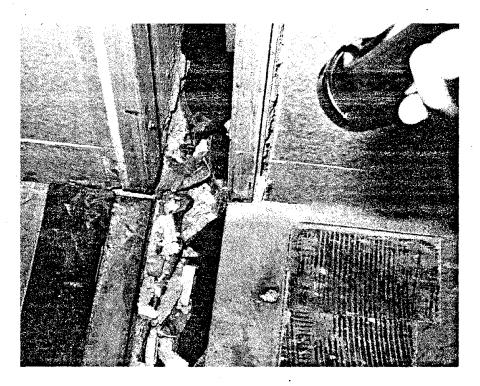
DAMAGE TO FLEXIBLE EXPANSION JOINT AT FIFTH FLOOR LEVEL OF BUILDING 3B
